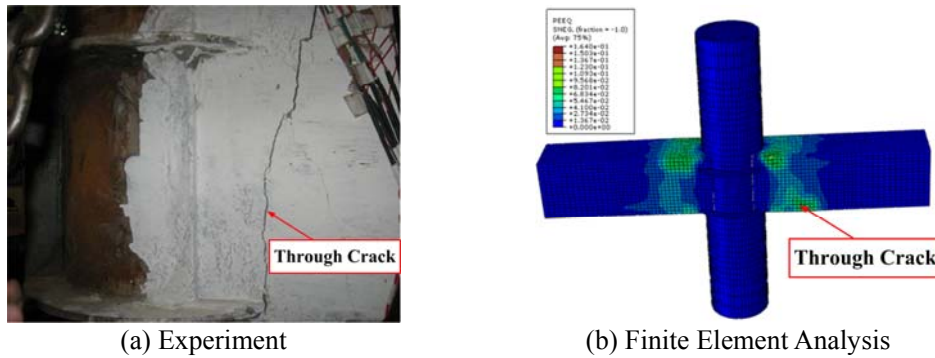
Failure Modes of the Rebar-penetrated Connection
